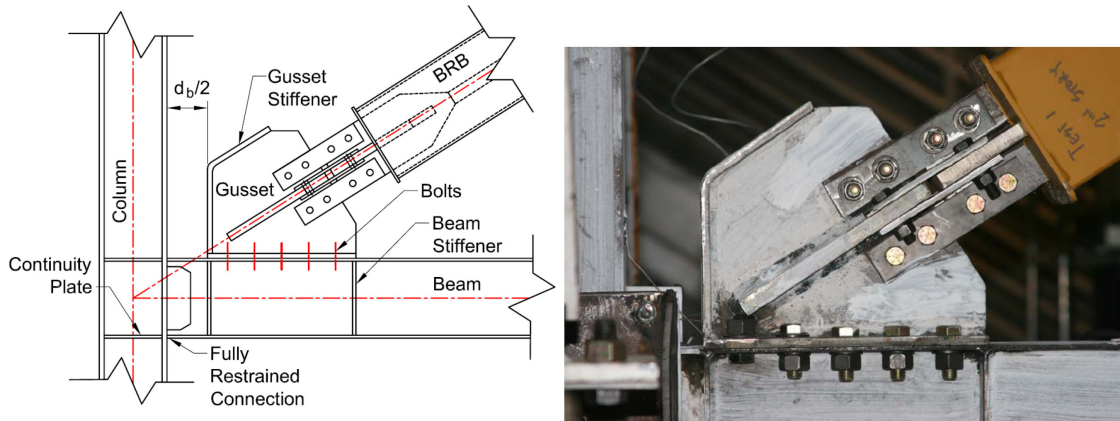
Schematic and in-place views of the proposed BRB connection
